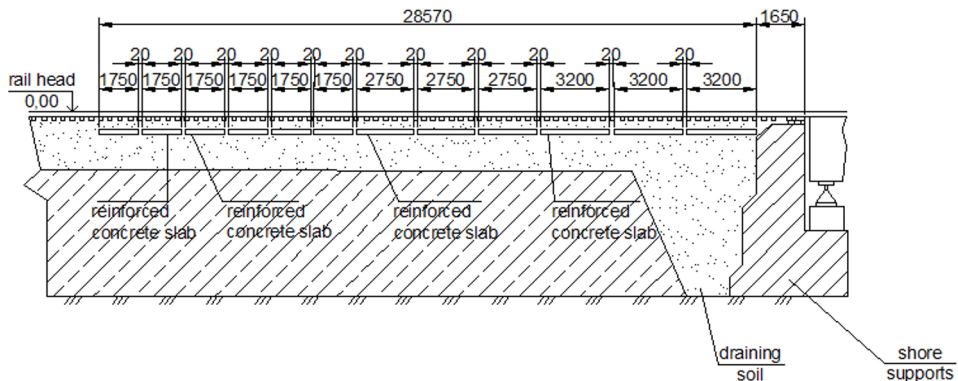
Transition with sub-ballast reinforced concrete slabs
